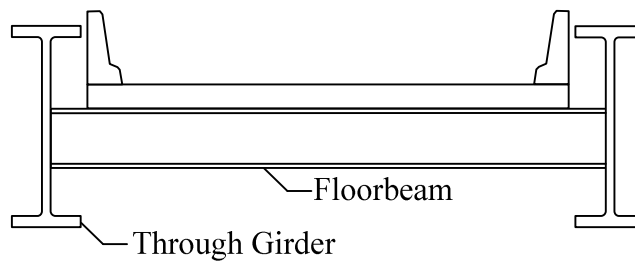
STEEL THRU-GIRDER-FLOORBEAM SYSTEM
